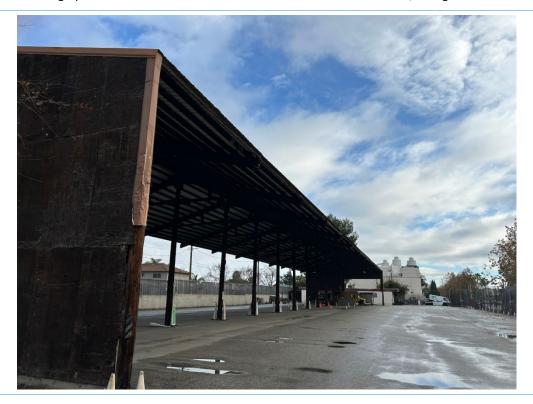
View of southwest corner of shed near 275 E. Santa Ana Street, facing northwest.
